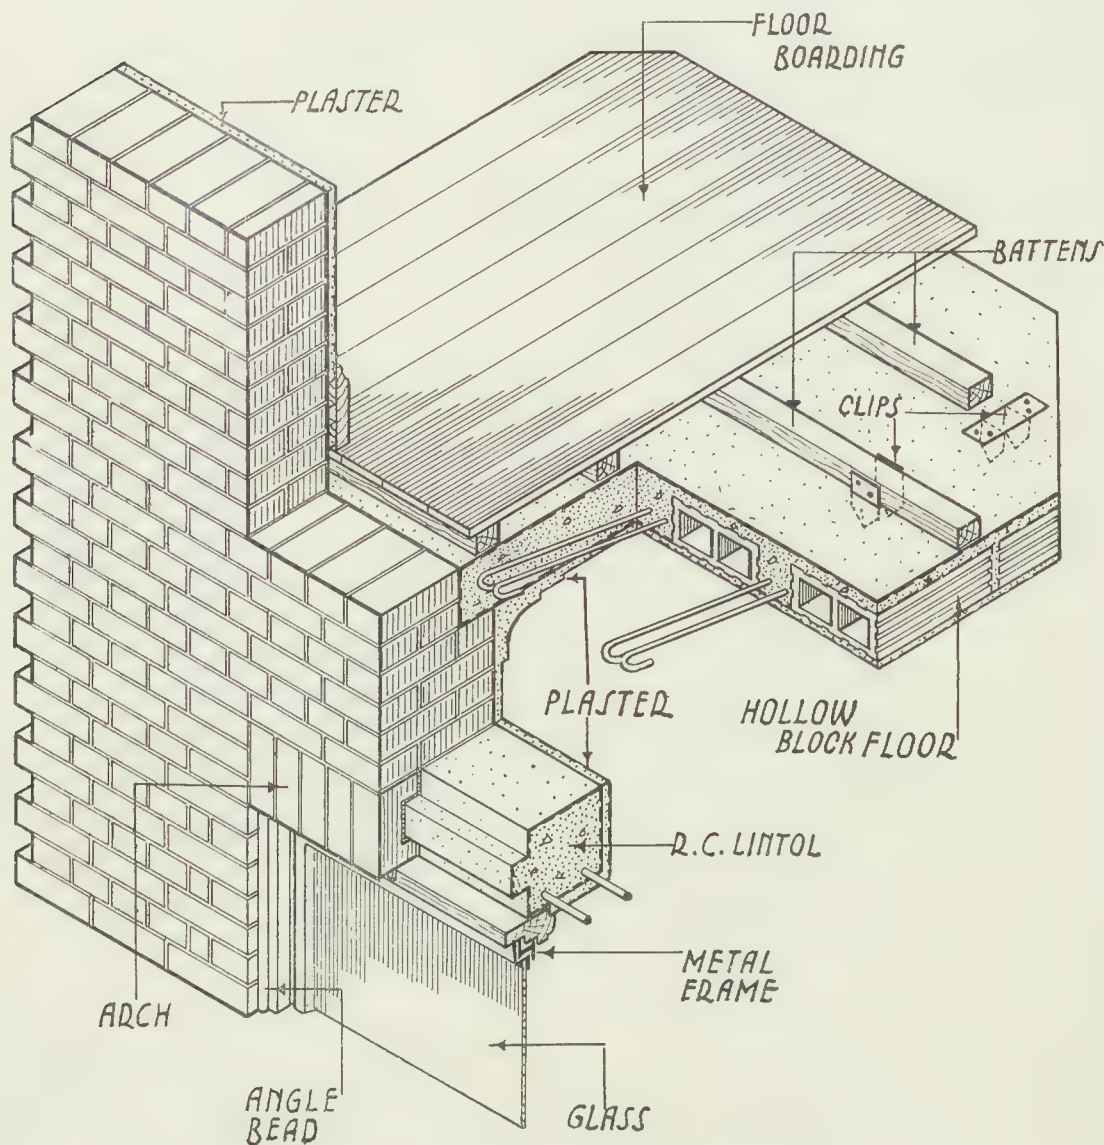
BRICK SOLDIER ARCH SUPPORTED UPON REINFORCED CONCRETE LINTOL
